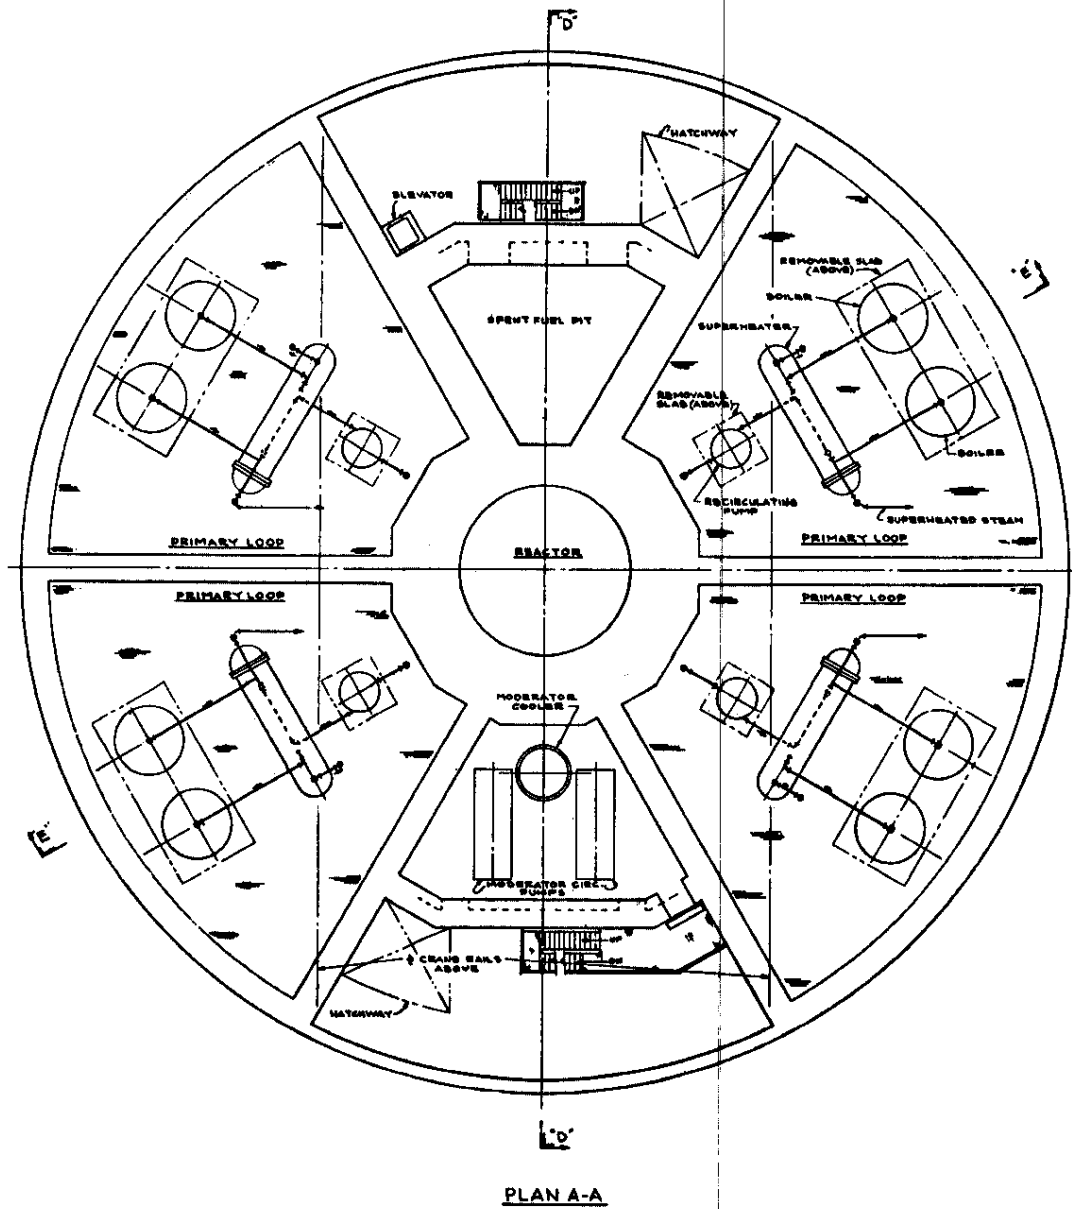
EQUIPMENT LAYOUT FOR 300-MWe PLANT
